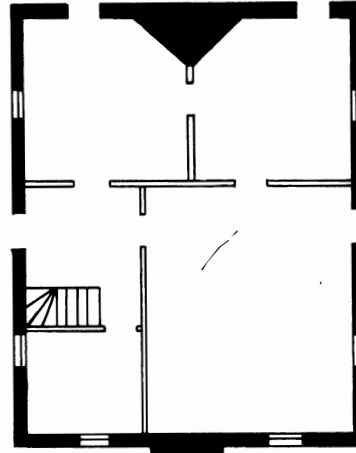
Crawford-Kegley House Plan. Original four room plan shown, but like the Poage house, a later partition had been added to create a front hall.
